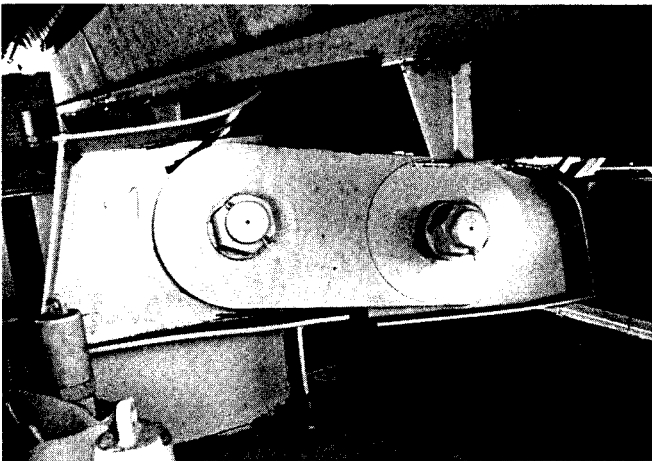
Link connecting the approach span to the end pier on the Higashi-Kobe Bridge.
